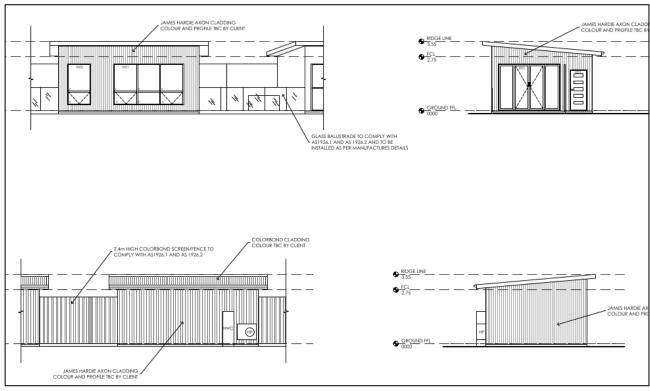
Units 2-5 - elevations (Source: RFS Projects)
